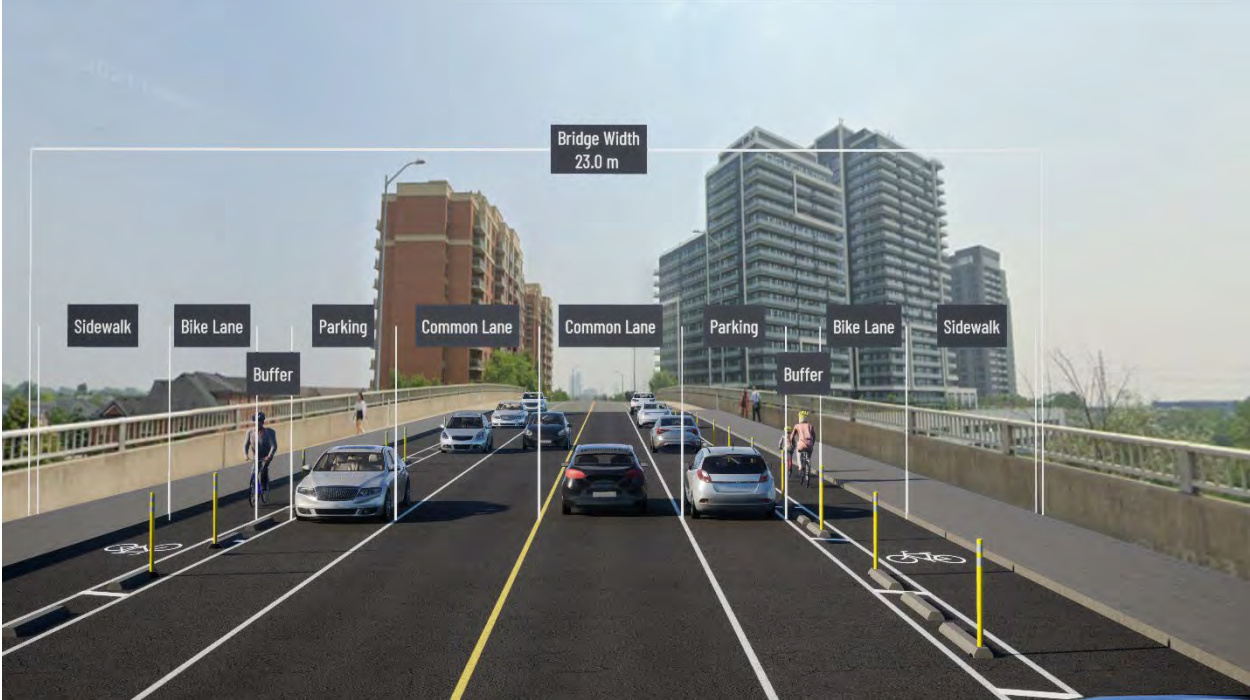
Corridor Option C2 – Protected bike lanes on Bantry Avenue Bridge between Yonge Street and Maple Road – (Looking east)
